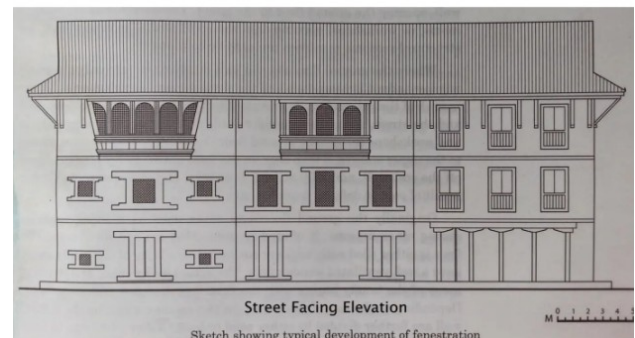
Traditional Newari building facade of Malla, Shah and Rana Period (Korn, 1976)
